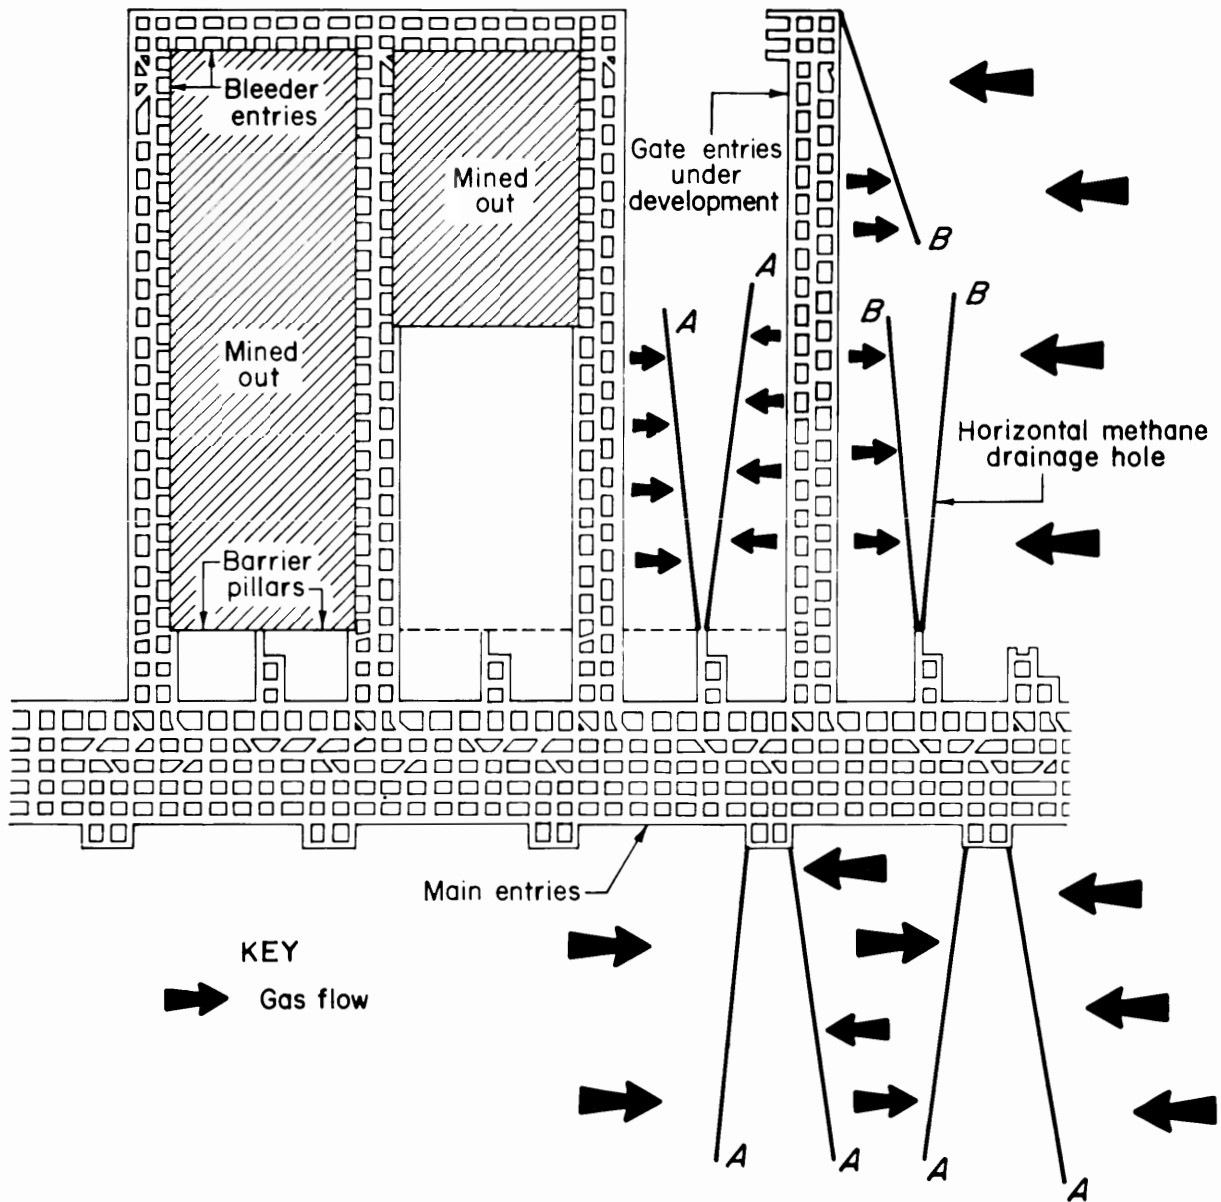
Schematic plan view of long horizontal boreholes for methane drainage in longwall mining in advance of mining (A) and for shielding (B).
